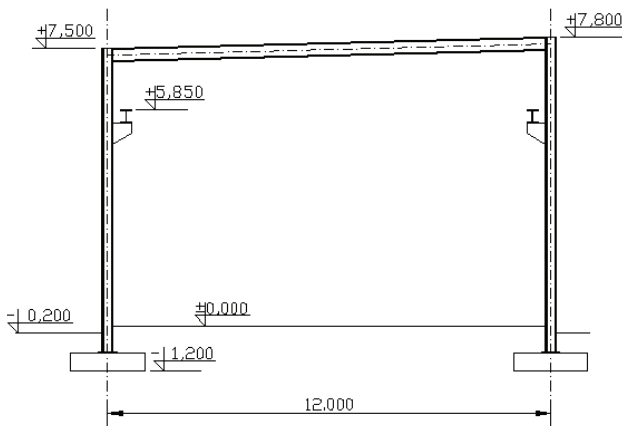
Cross-section of the industrial hall with internal handling systems [6]
